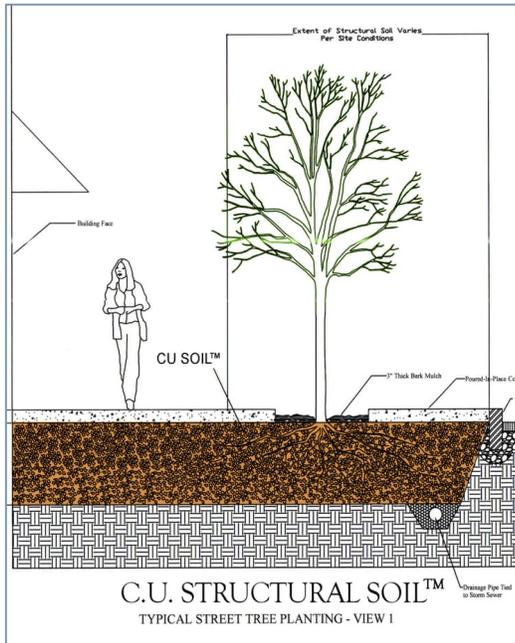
Soil extension to sidewalks (illustration from Casey Tree, 2008)
